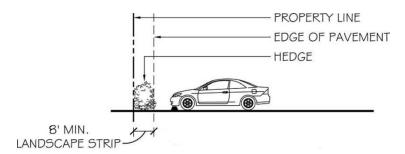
Landscape Strip Adjacent to Property Line
